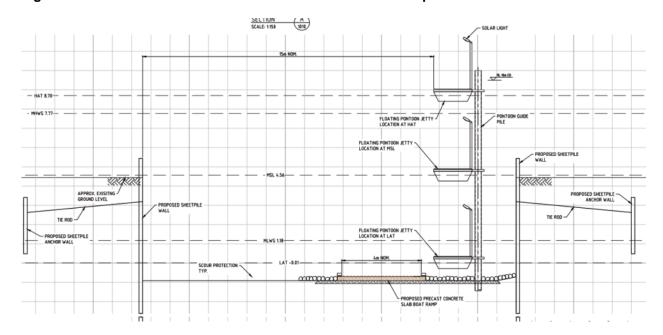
Typical Section – Alternative Location – Sheet Pile Wall Option
